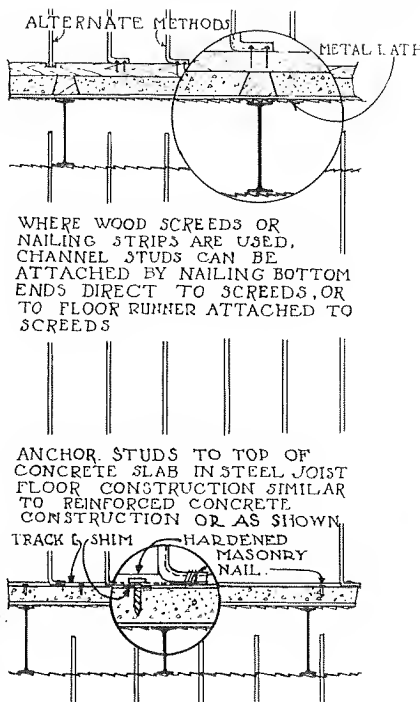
(ABOVE) Studs pushed through holes cut in ceiling lath; alignment channel omitted.
